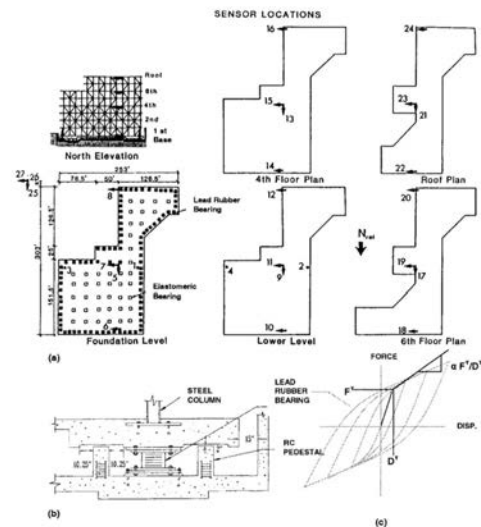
USC Hospital Building (1 ft = 0.3048 m; 1 in. = 2.54 cm): (a) Elevation, Plan, Sensor Locations; (b) Isolation System Details; (c) Smooth Bilinear Hysteretic Force-Displacement Loops of Lead-Rubber Bearing
